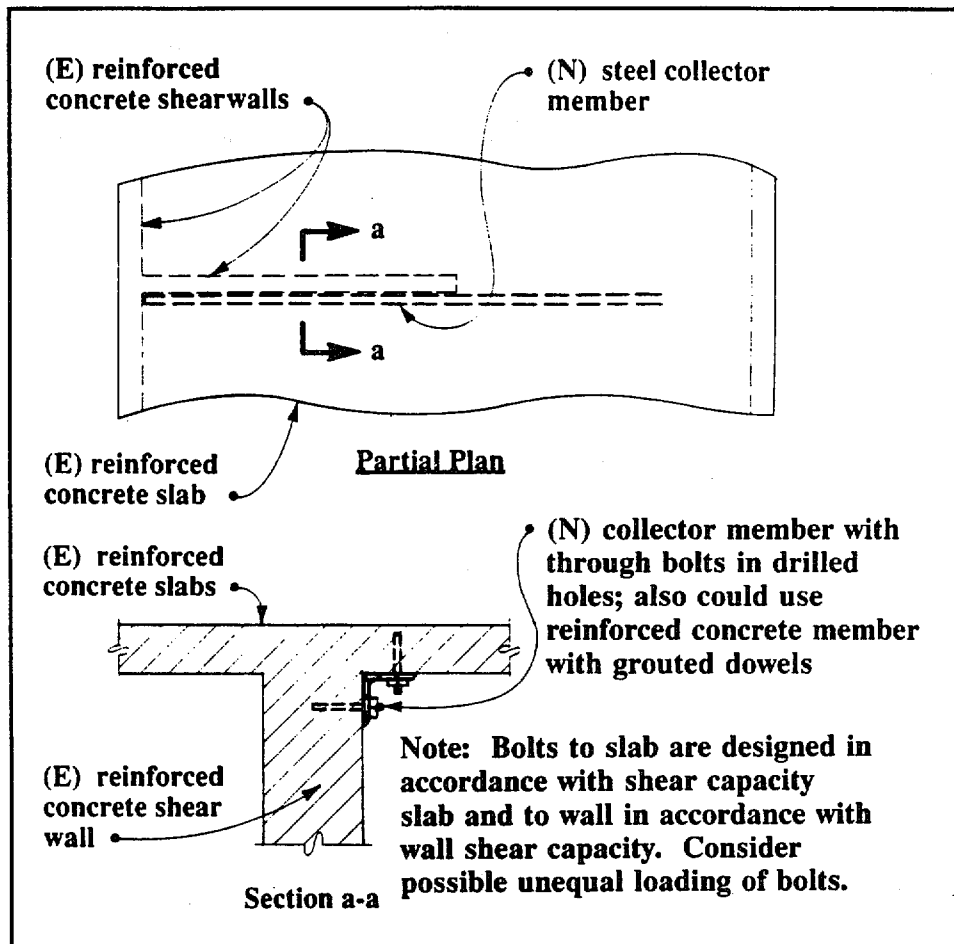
Use of a collector member to improve shear transfer from a concrete diaphragm.
